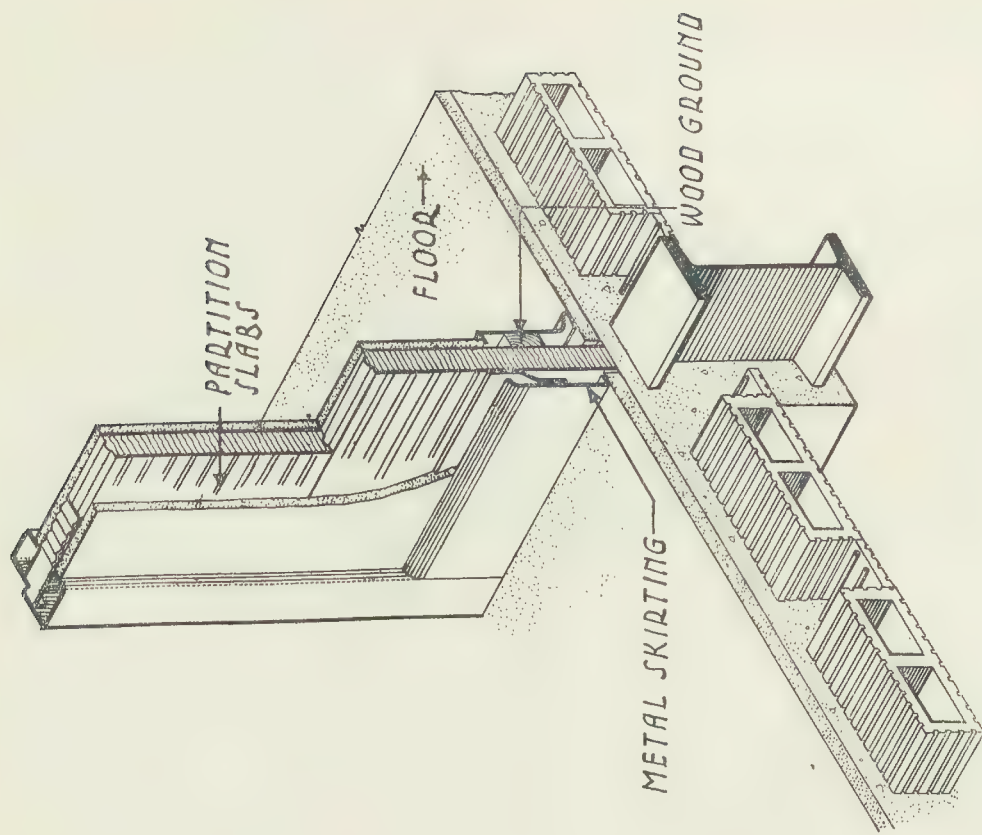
"METAL TRIM" DOOR FRAME IN SLAB PARTITION WALL
